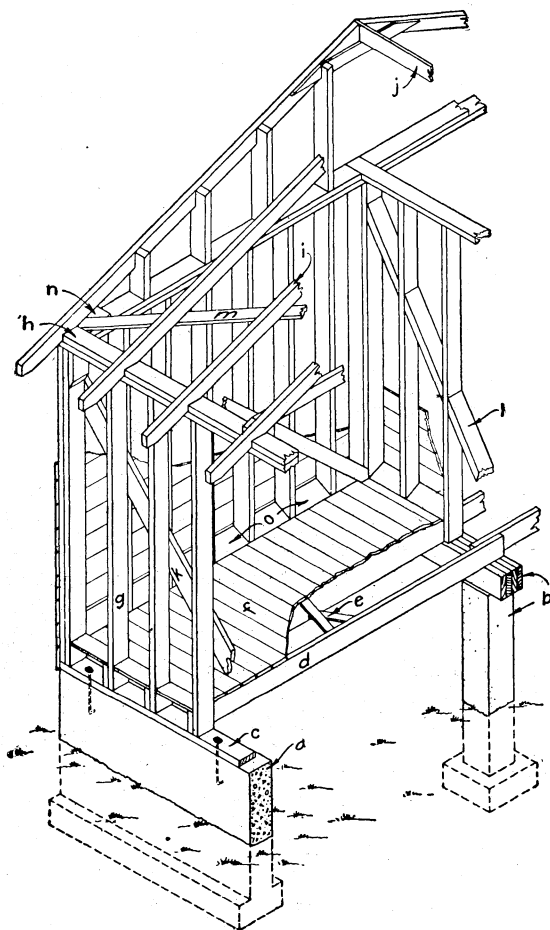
Framing of granary of balloon-type construction: *a*, Continuous-wall foundation; *b*, pier and girder construction; *c*, sill; *d*, joist; *e*, bridging; *f*, floor; *g*, stud; *h*, double plate; *i*, rafter; *j*, ridge pole; *k*, brace spiked to inside of the studs; *l*, brace cut between the studs; *m*, brace spiked to the under side of rafters; *n*, wedge block under end of rafter brace; *o*, beveled boards between studs
